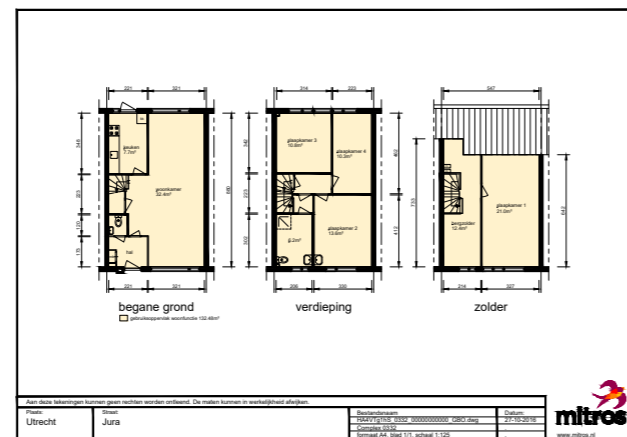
Floorplans of case study building, provided by housing company Mitros
